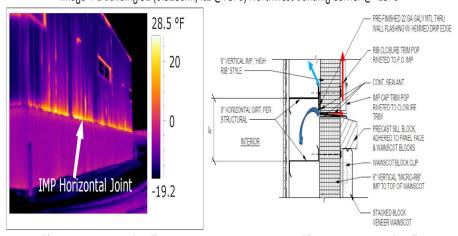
Bldg. 31 IMP Horizontal Wall Joint @+25Pa
